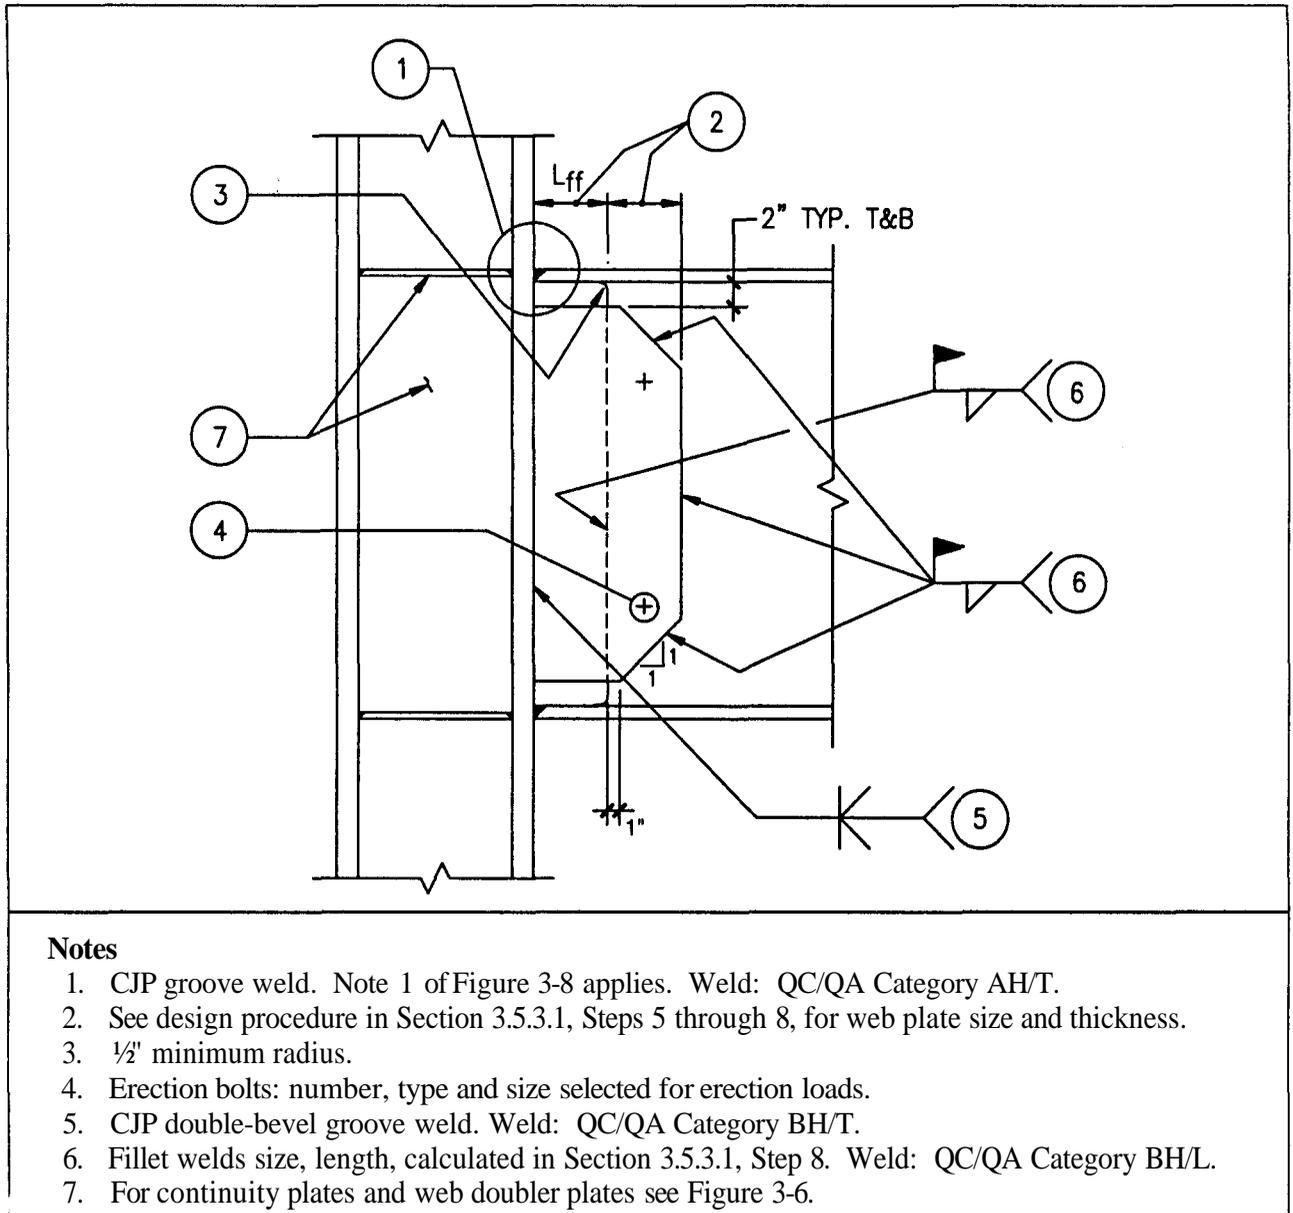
Welded Free Flange (FF) Connection
